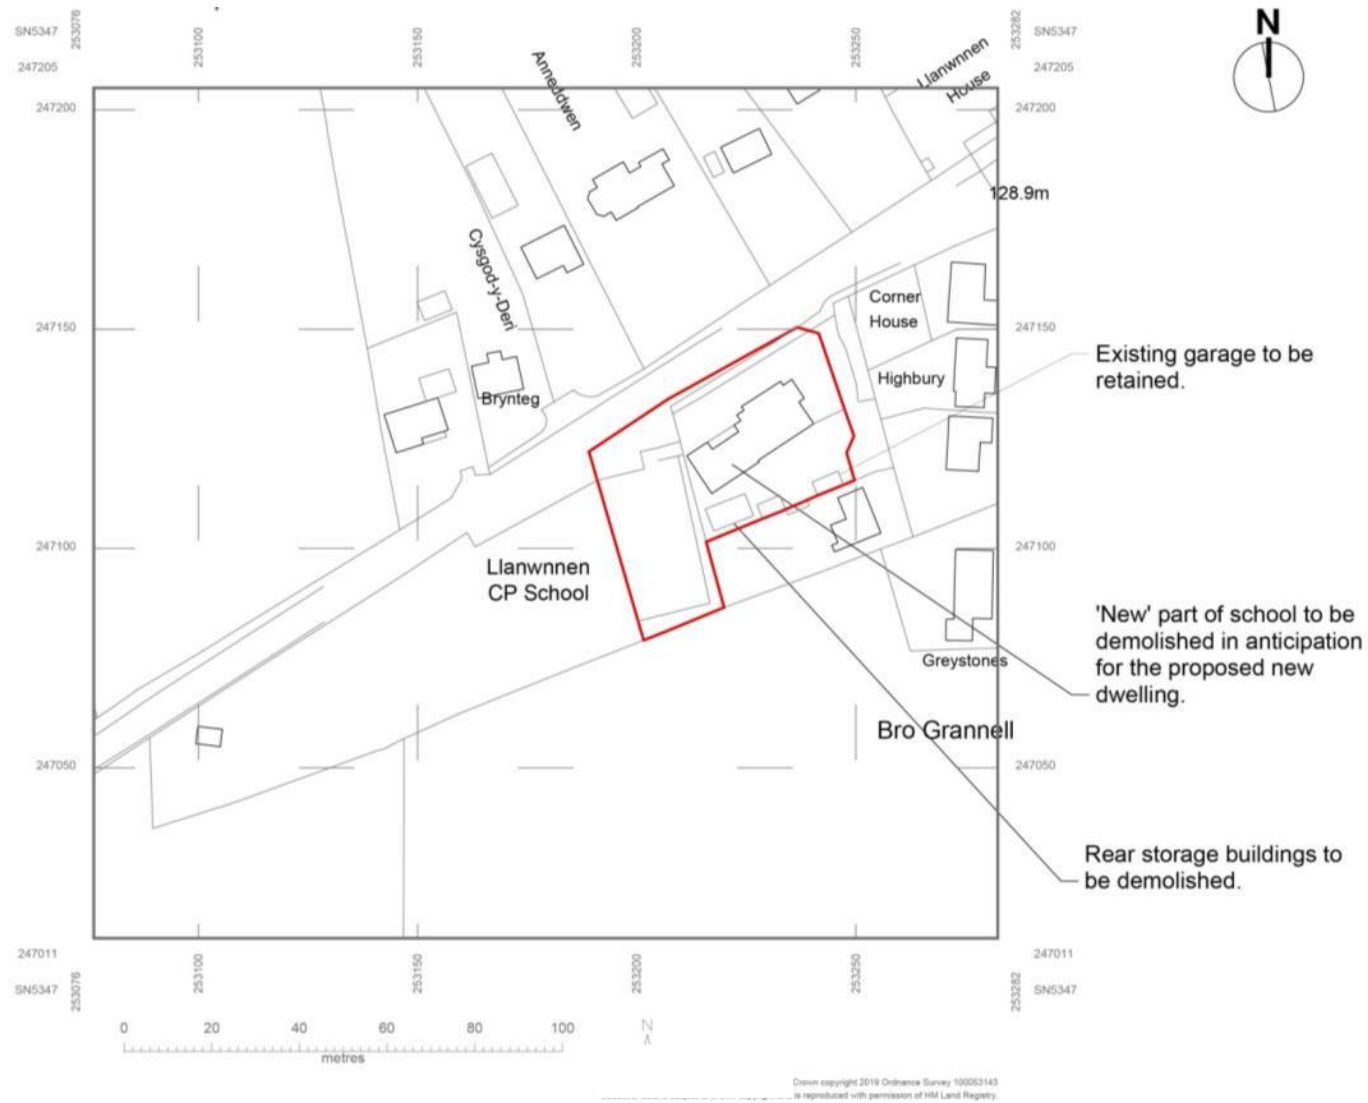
Detailed site location plan of development area (red). Original plan provided by the client, produced by Mark Baggott Chartered Surveyors & Architectural Practice, 04/04/2019. This plan is not reproduced to scale.
